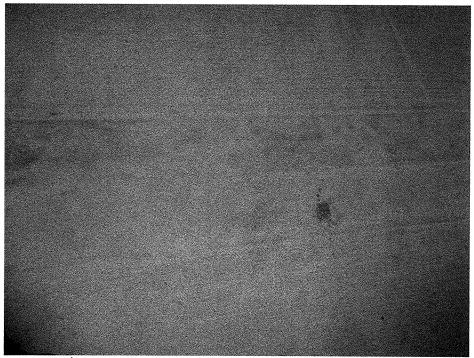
6th Street Ramp – Damage at existing traffic coating atop original construction joint at roof level.
